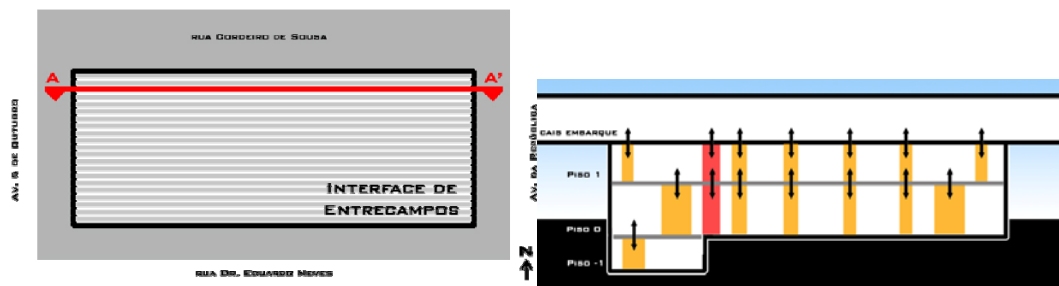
Interface implementation floor plan (sketch); Section AA': vertical access inside of the building
